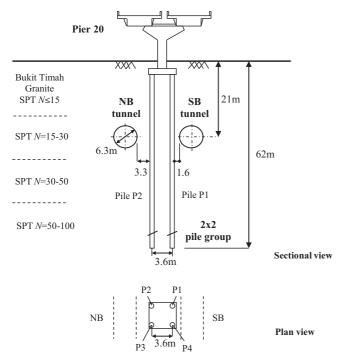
Pile and tunnel layout at Pier 20 (after Pang, 2006).
